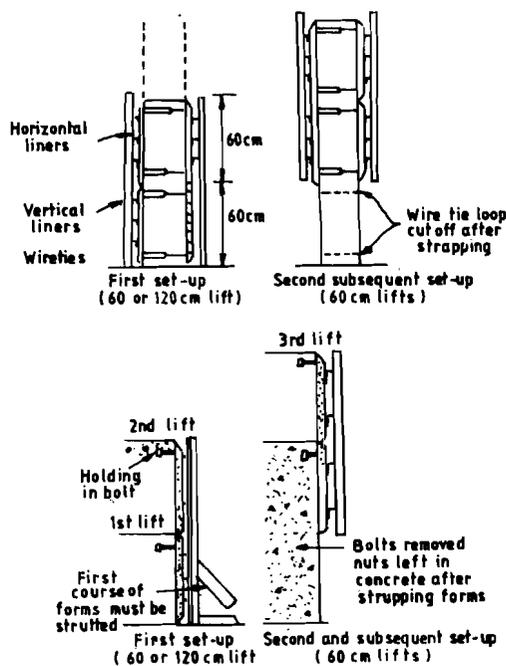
Climbing Formwork of Steel Forms for Thick Walls
